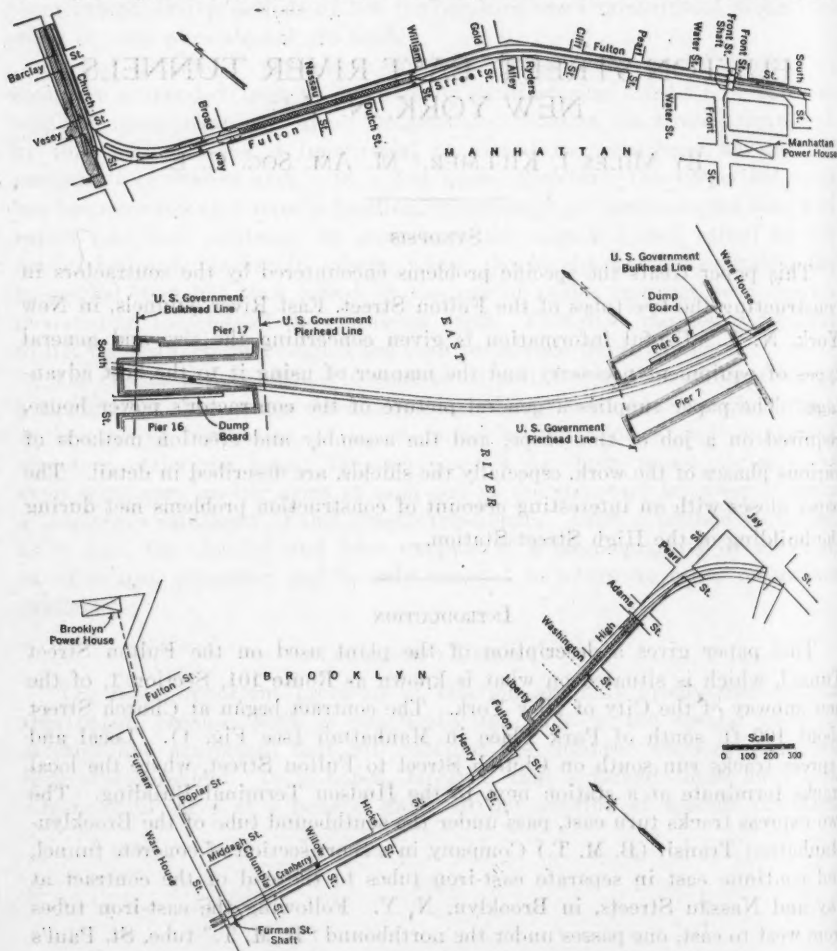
GENERAL PLAN OF FULTON STREET, EAST RIVER TUNNELS.
